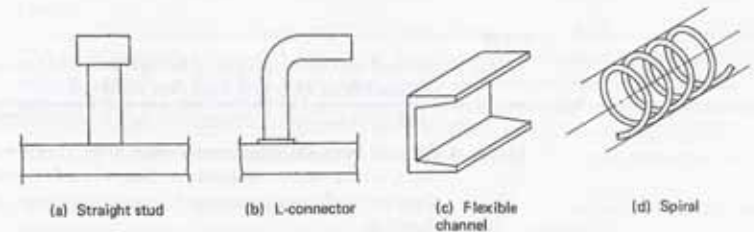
Shear connectors for concrete slab to steel beam construction.
